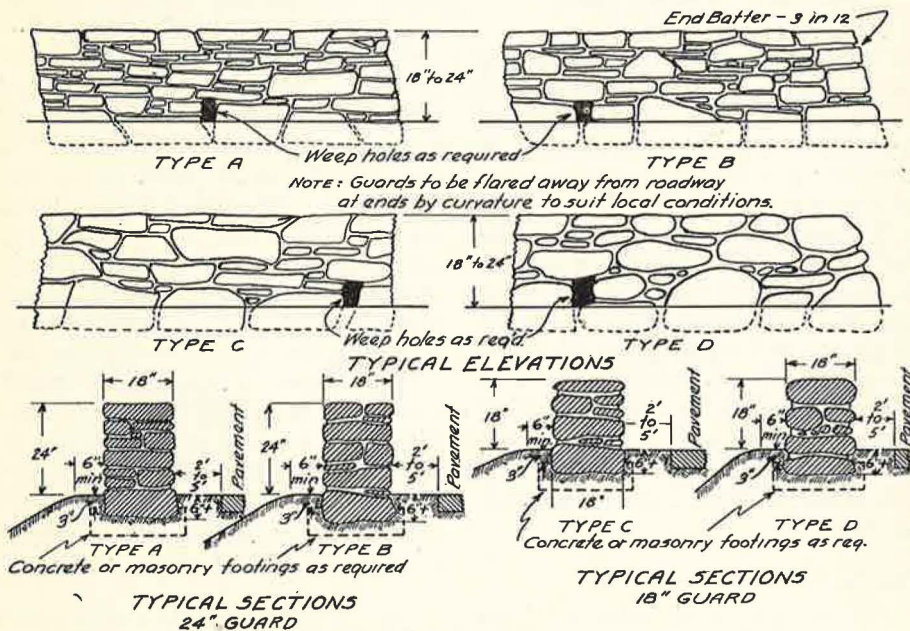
Details of Cement Mortar Stone Masonry Guards
